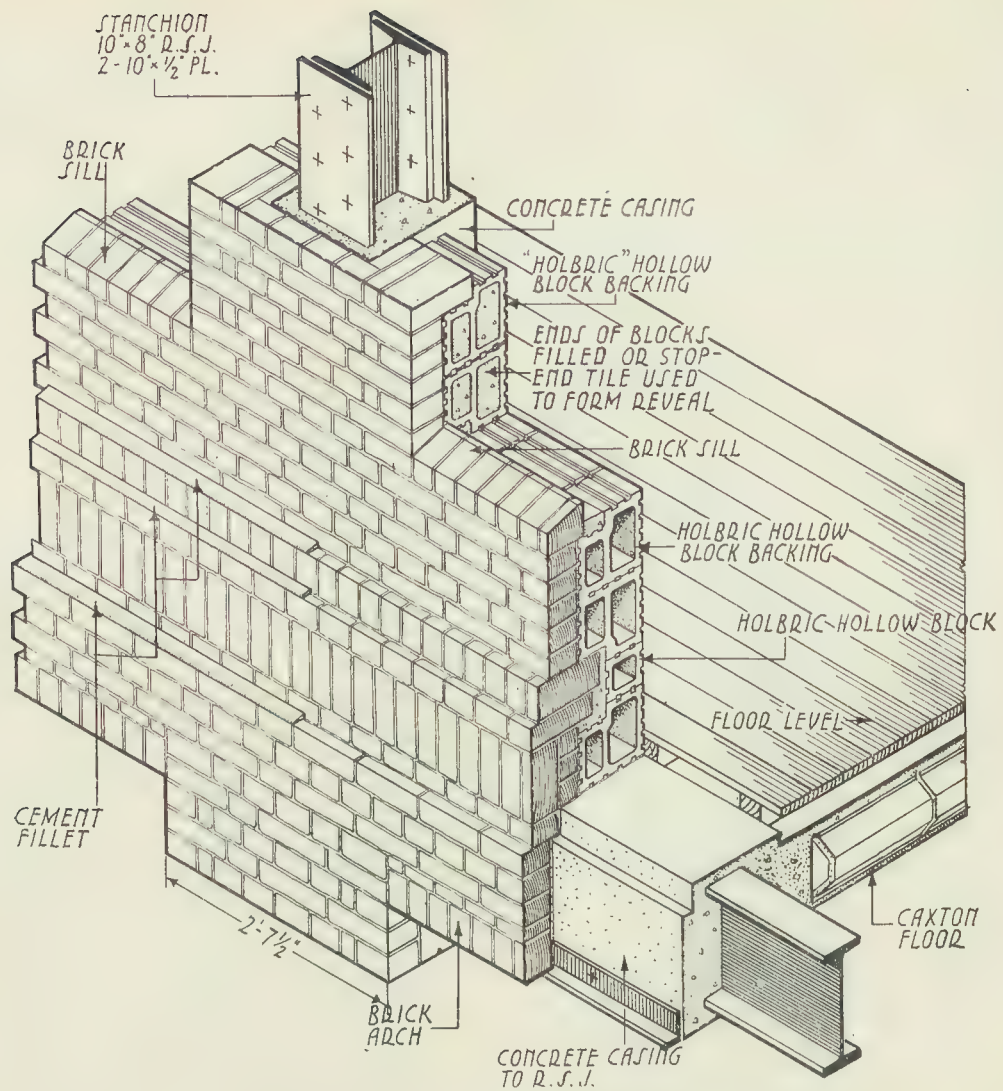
BRICK-FACED WALL BACKED WITH HOLLOW BLOCKS
